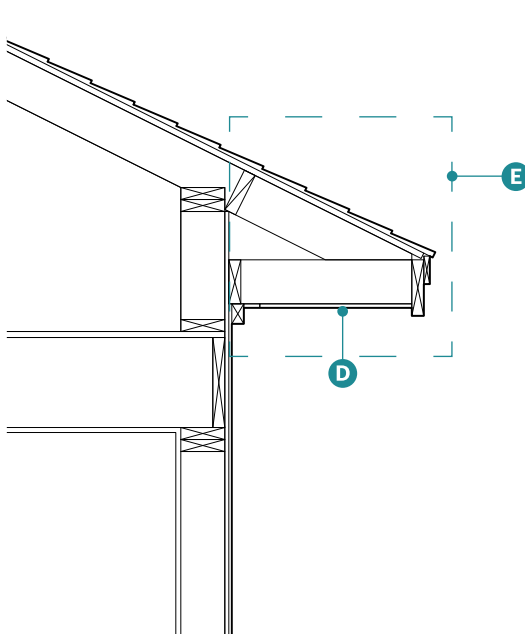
Section Detail of Highest Eave for Pitched Roof
